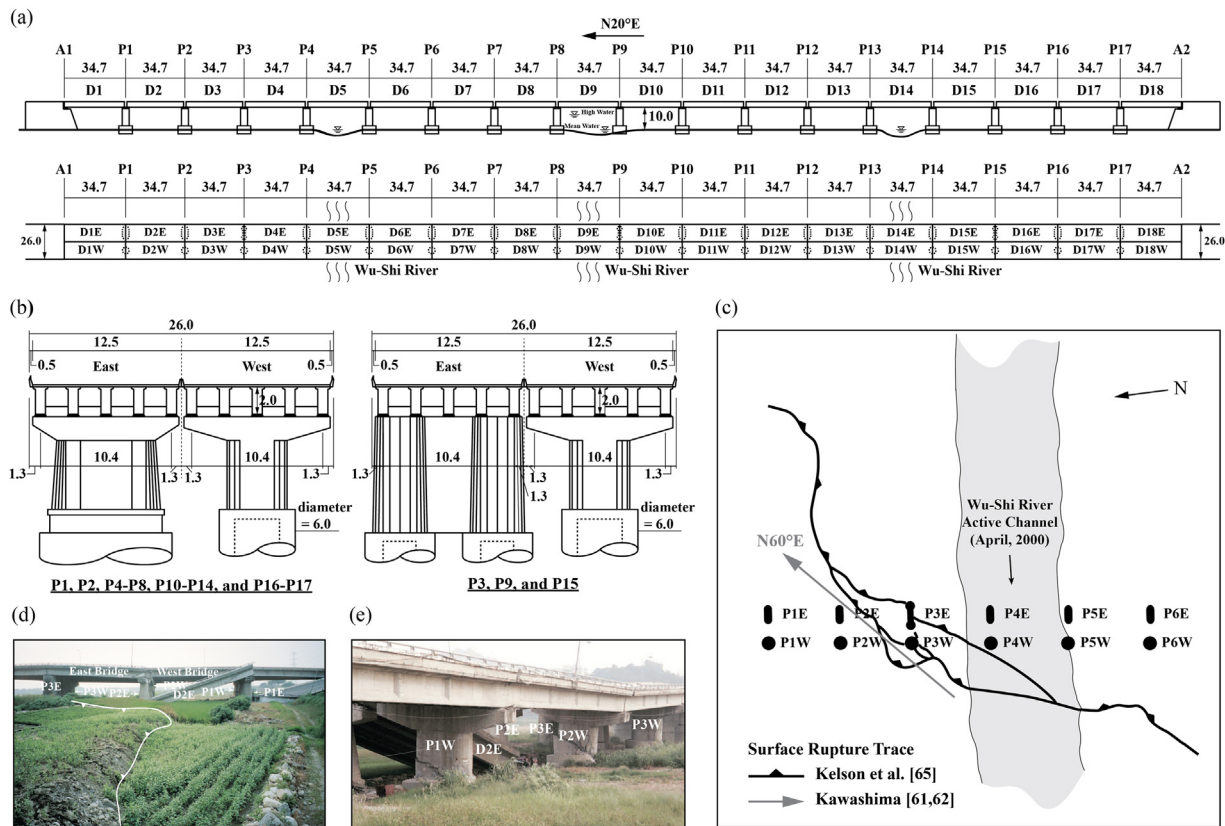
Wu-Shi Bridge during the 1999 Chi-Chi earthquake: (a) elevation and plan views of original bridge (unit: m); (b) typical sections of bridge (unit: m); (c) map showing bridge crossed by surface fault rupture; (d) collapsed deck; (e) shear failure in piers P1W and P2W (Fig. 7a and b is generated based on information provided by Hsu and Fu [50]; Fig. 7c is generated based on information provided by Kelson et al. [65]; Fig. 7d and e is modified from Kelson et al. [65]).
